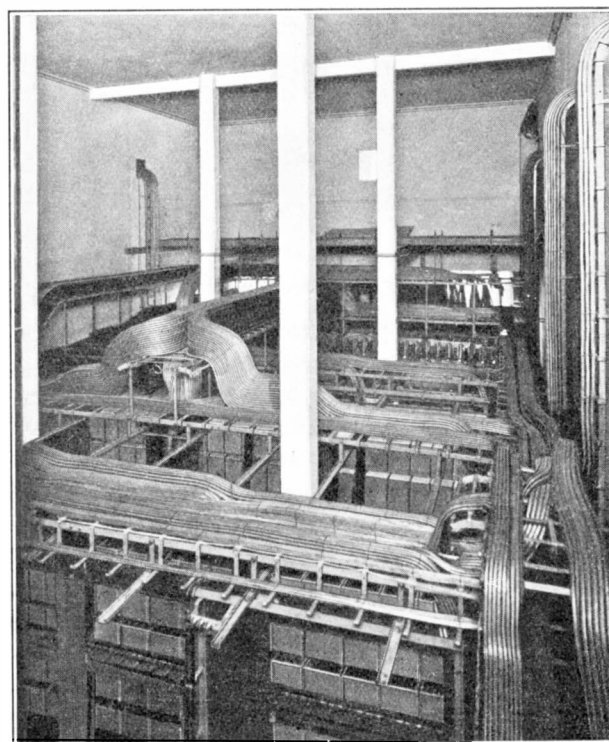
CABLING ABOVE RACKS IN MAIN INDICATOR BUILDING
